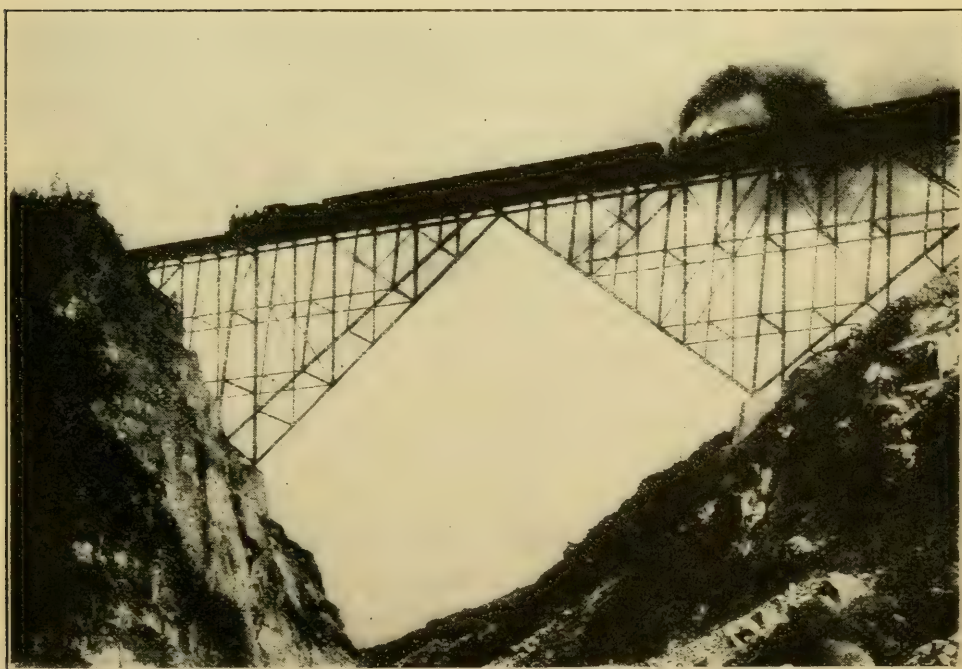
SWITCHBACK ARCH. WHITE PASS AND YUKON RAILWAY, ALASKA.
